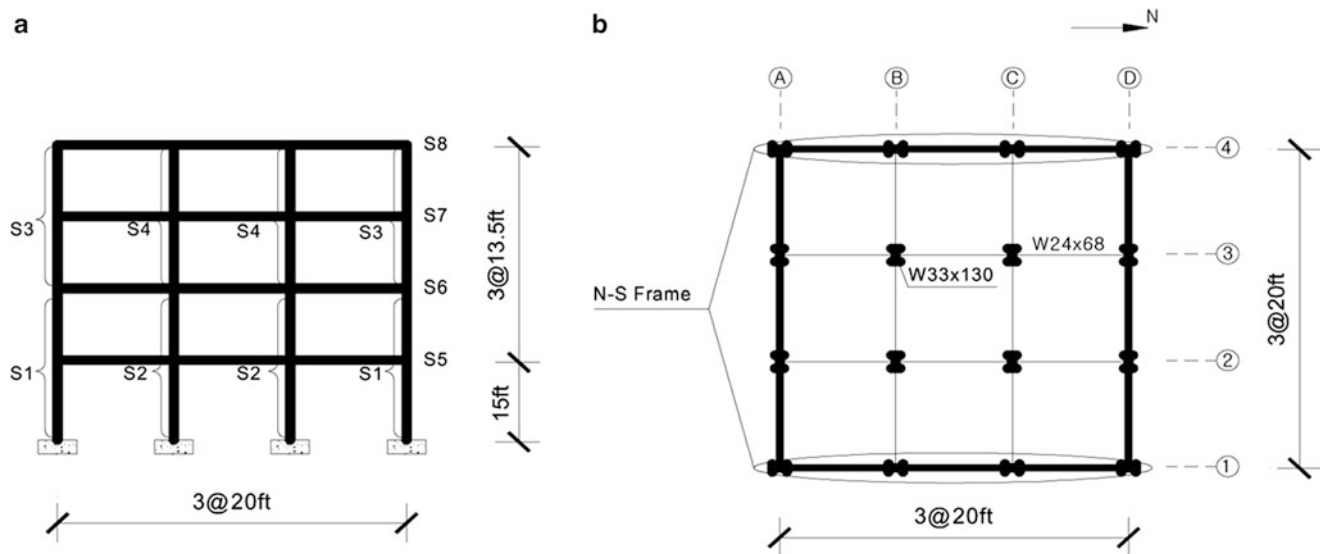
(a) Elevation view and (b) plan view of the example steel moment resisting frame
